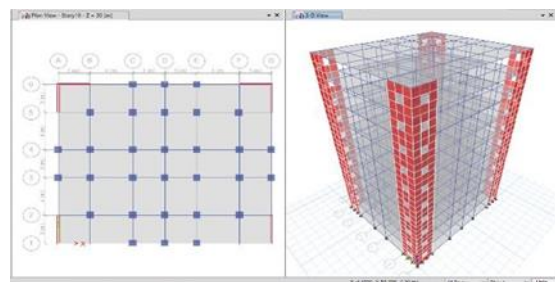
Plan and 3D view of model with corner shear walls with mid openings
